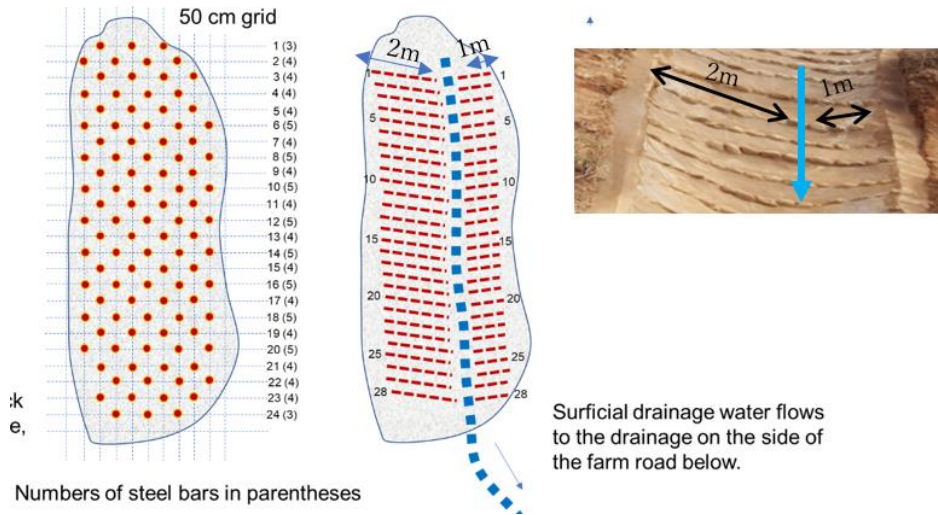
Structure of vertical drainage works (left side of slope) for vegetation works.
